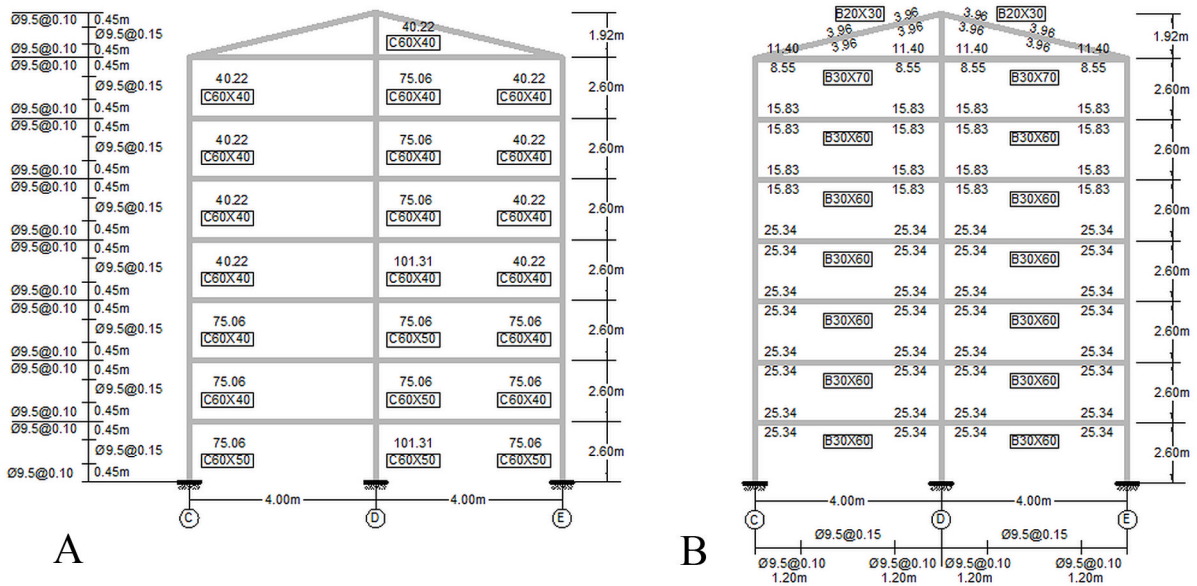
Residential building, geometry and reinforcement of frame 2 a) columns b) beams
